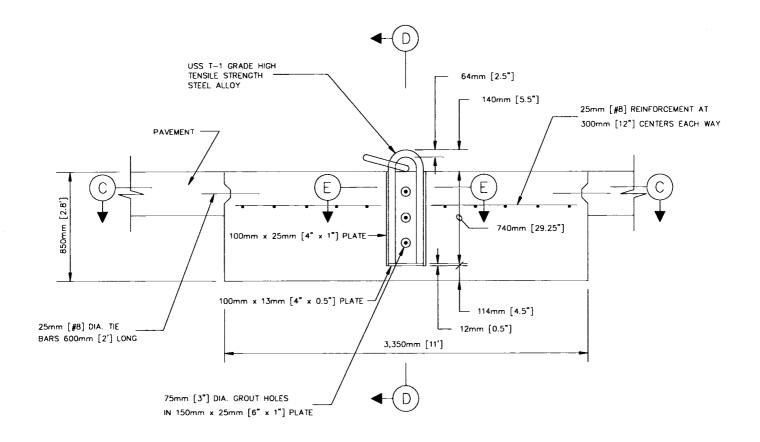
Example of Square Anchor Block, Cross Section A-A and B-B.
